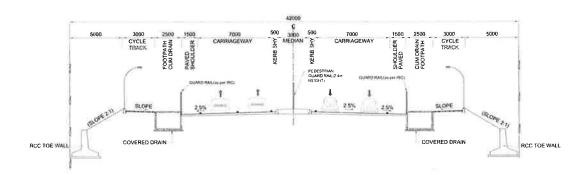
Typical Arrangement of Spur to Bahadurgarh (At-grade Section)
